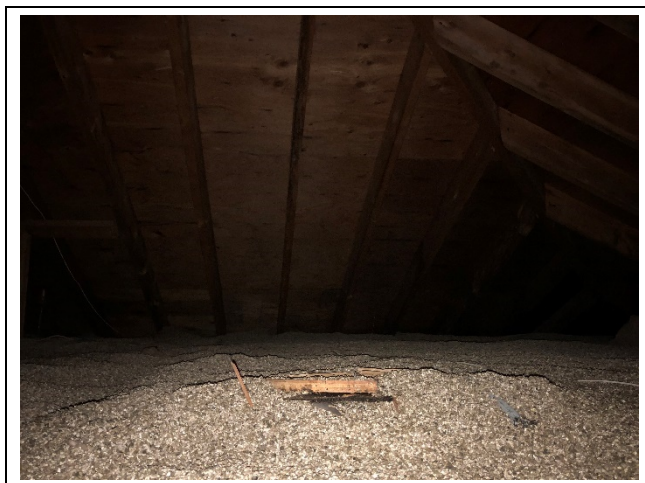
House – Asbestos-containing vermiculite insulation located in the attic.
